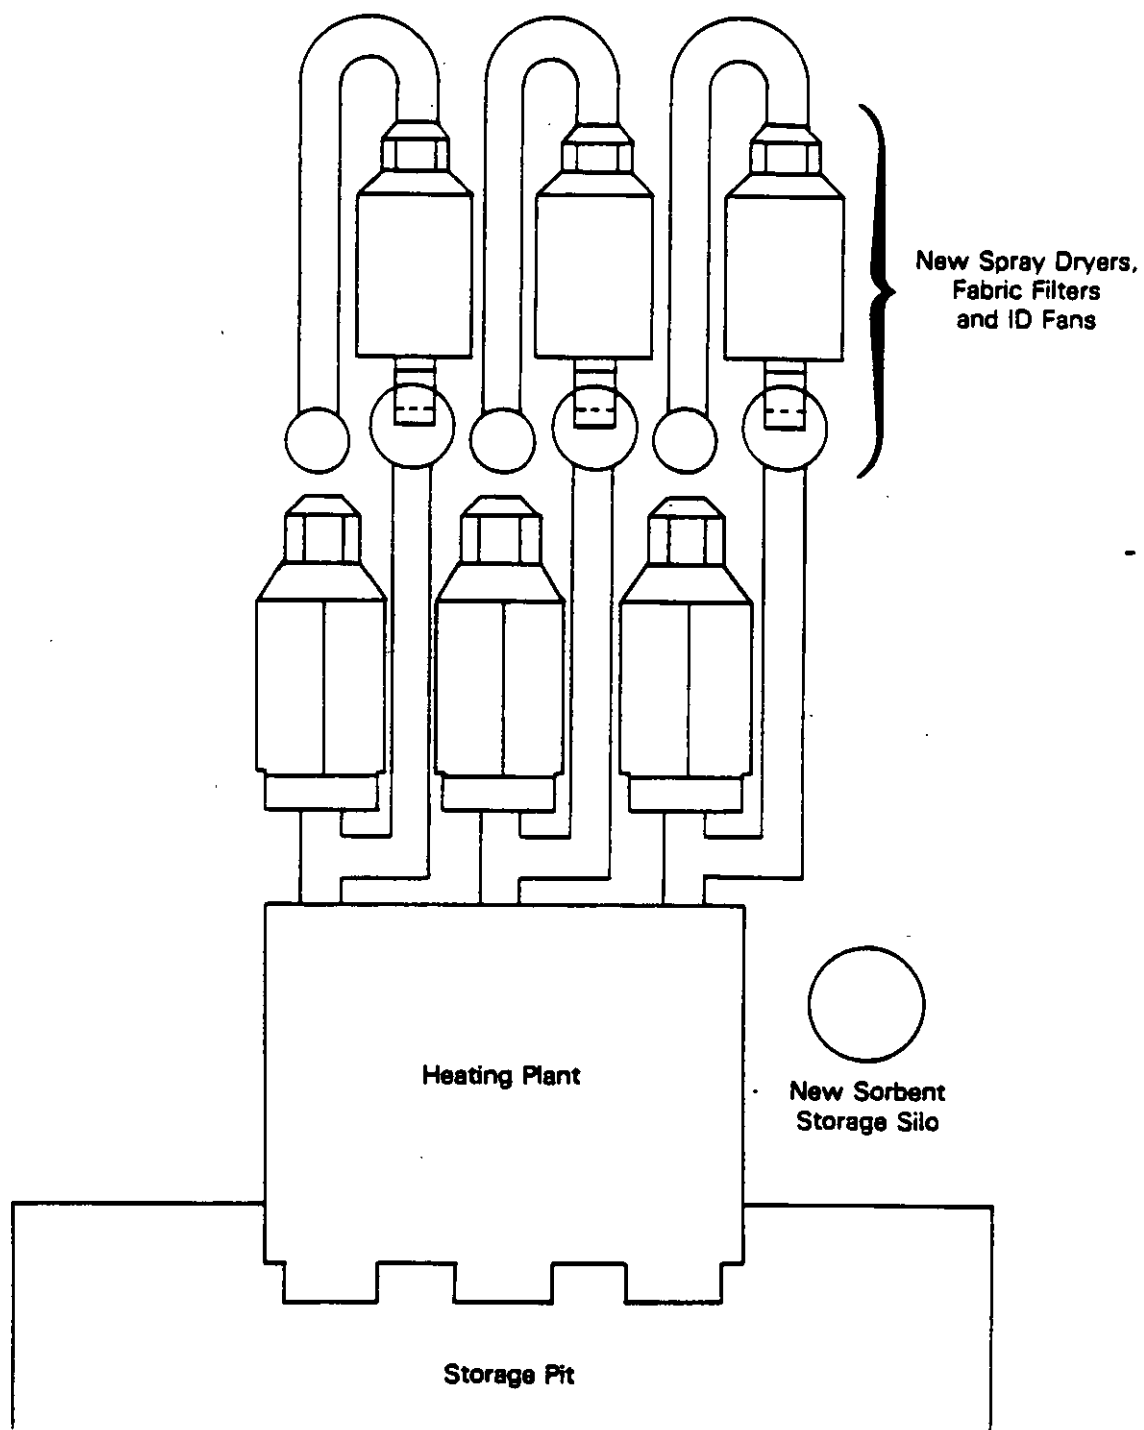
Plot Plan of Spray Dryer/Fabric Filter Retrofit Equipment Arrangement
